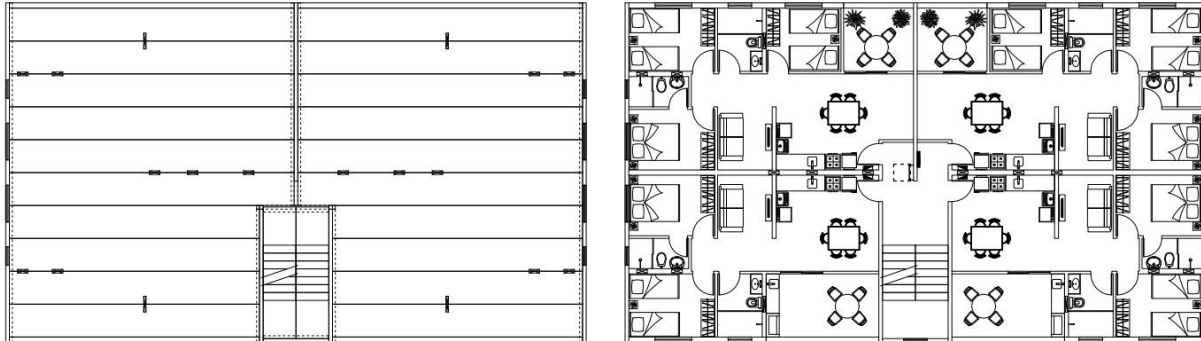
Architecture reference floor plan of the application example on the right and the structural reference floor plan on the left (Jorge 2017).
